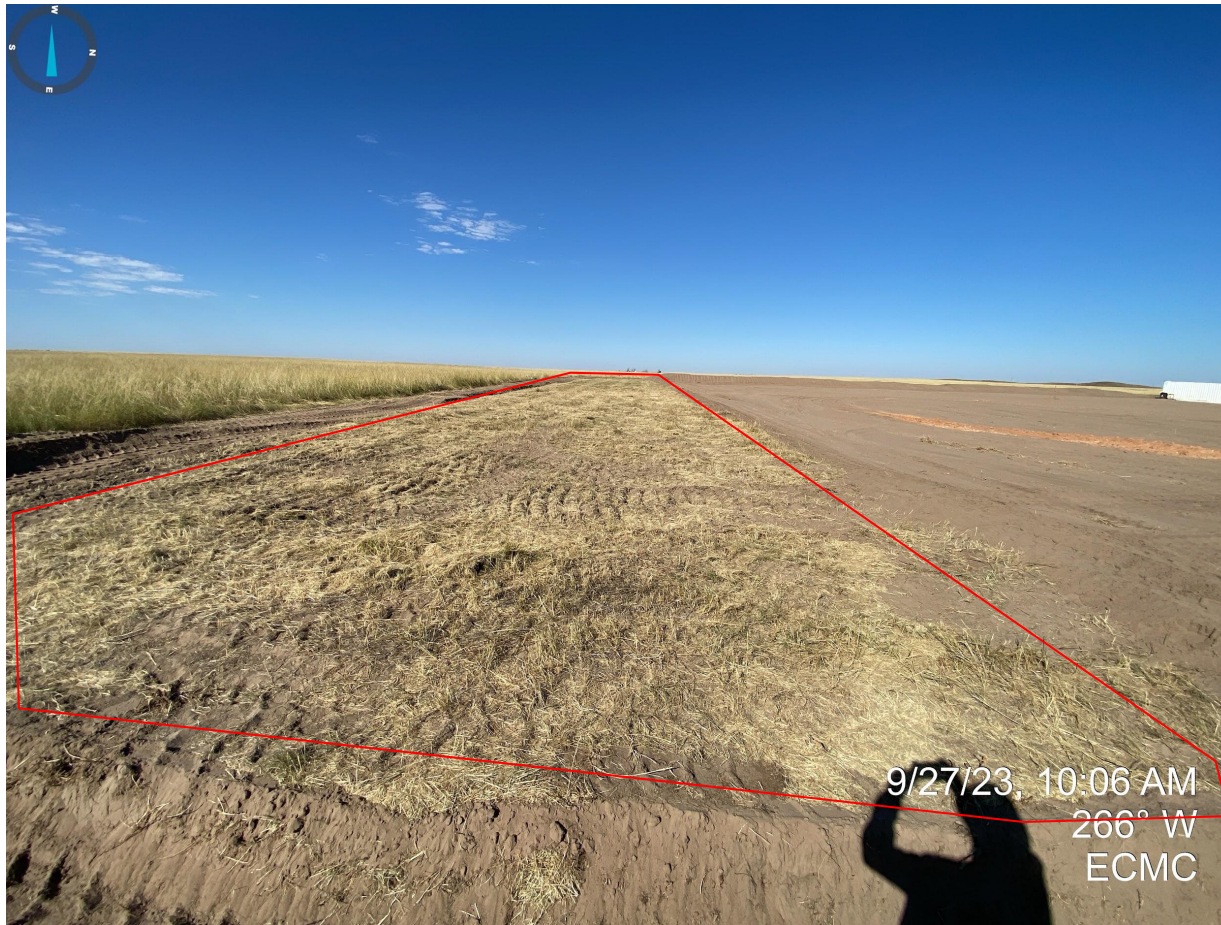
Taken near the southeast corner of the location. Photo illustrates that the Operator has not disturbed the entire permitted area for the construction of the pad. If the area outlined in red is to be used for any construction or drilling activities (equipment storage, parking, etc) then additional topsoil salvage shall occur within the defined area. Advise fencing or marking area to prohibit against such activity.
